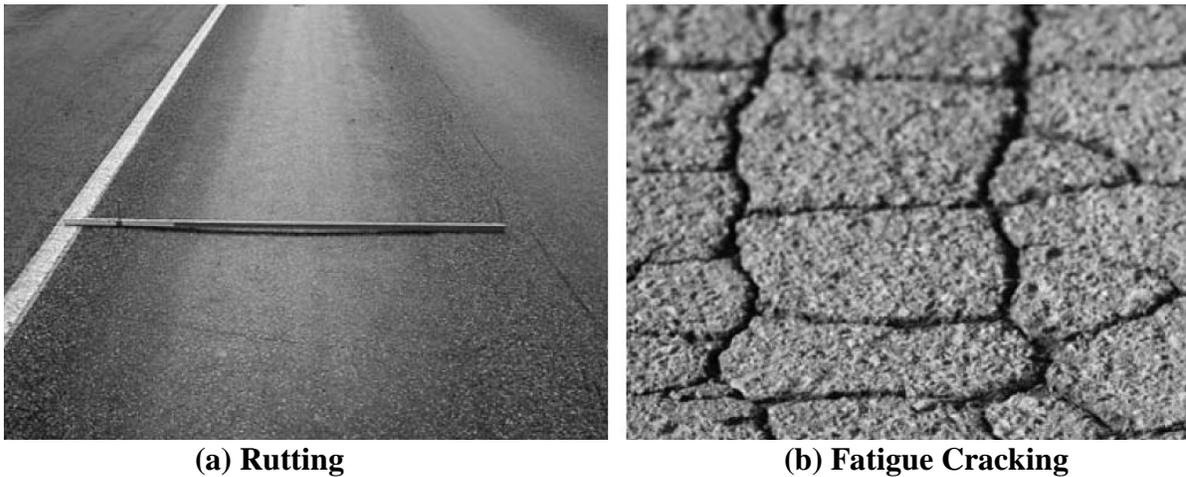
Early asphalt pavement failures due to moisture damage (1).
